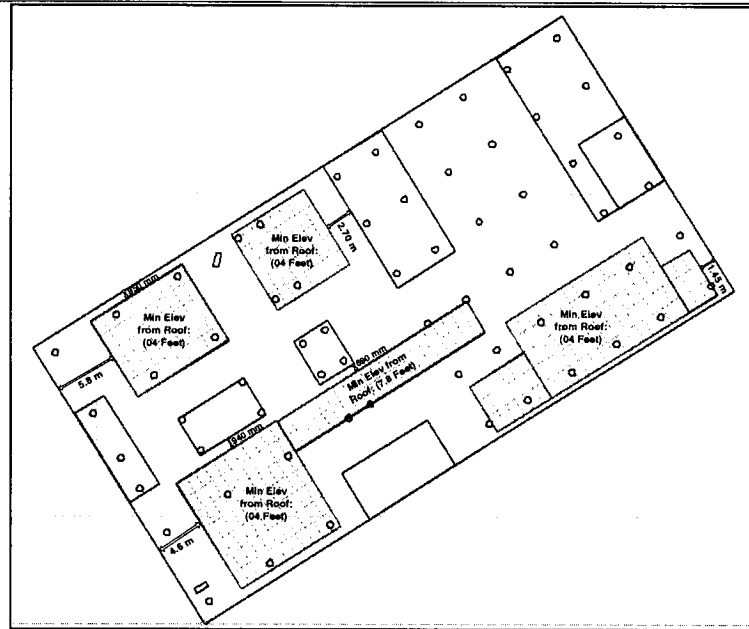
2D Layout of rooftop of Al-Maalik building showing solar panel locations
